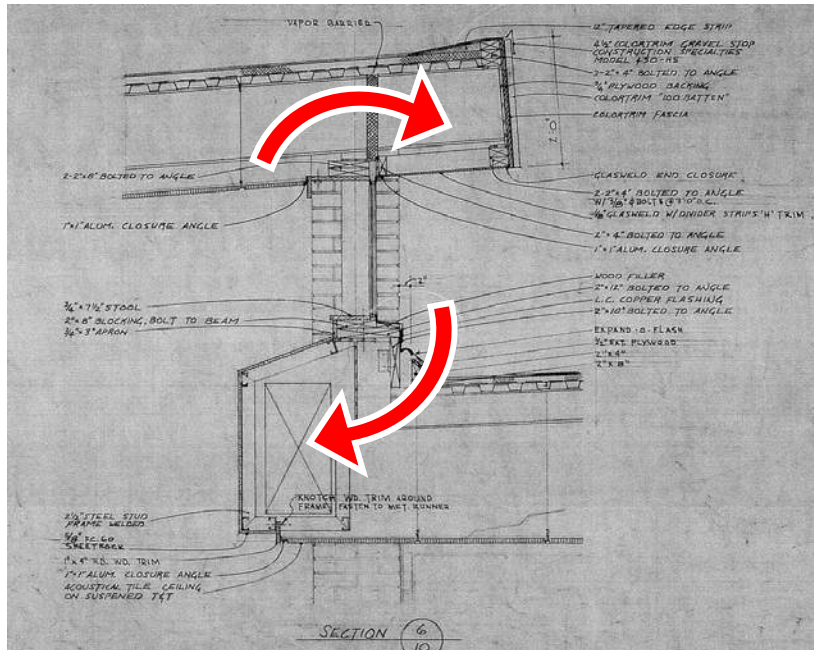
Clerestory window section. Taken from Detail 6/10 of the 1968 Drawings.
